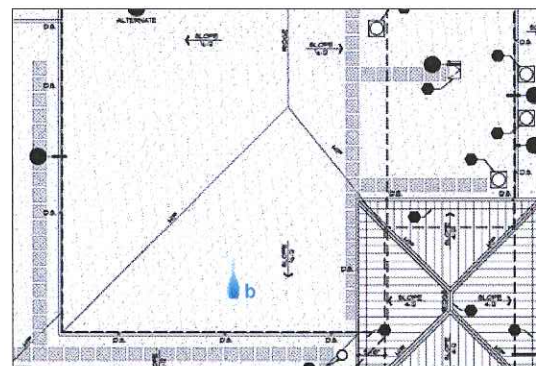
Partial Roof Plan at Leak Location (b).
